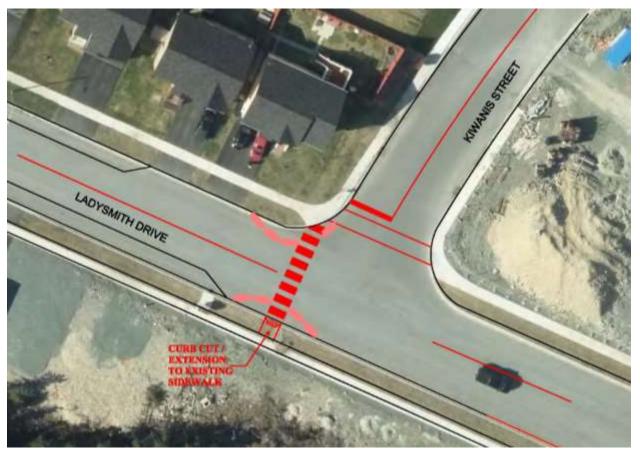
Ladysmith Drive at Kiwanis Street Pilot Plan
